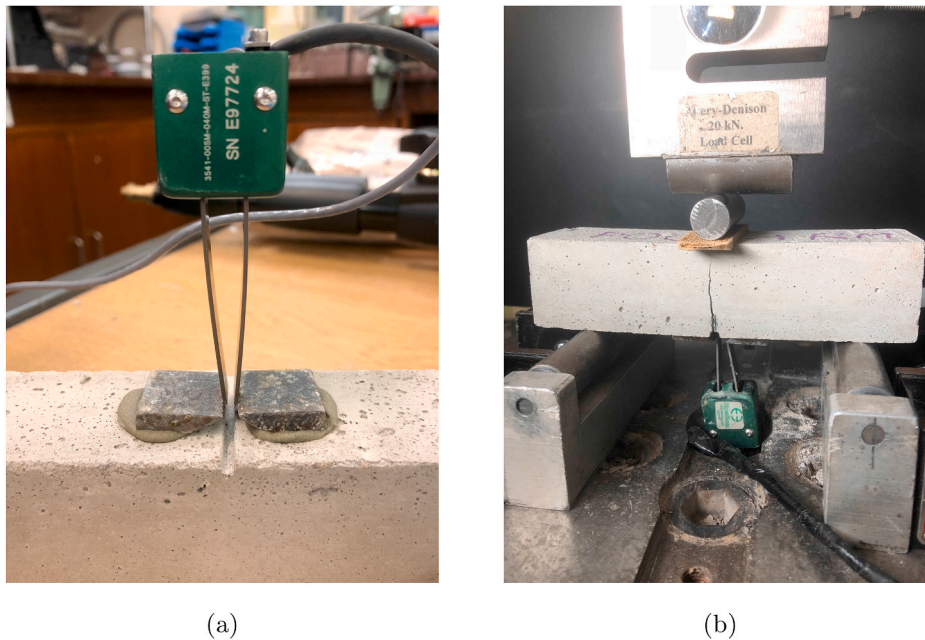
(a) Detail of knife-edge metal bars glued to the beam. (b) three-point bending test setup with CMOD clip gauge in place.
